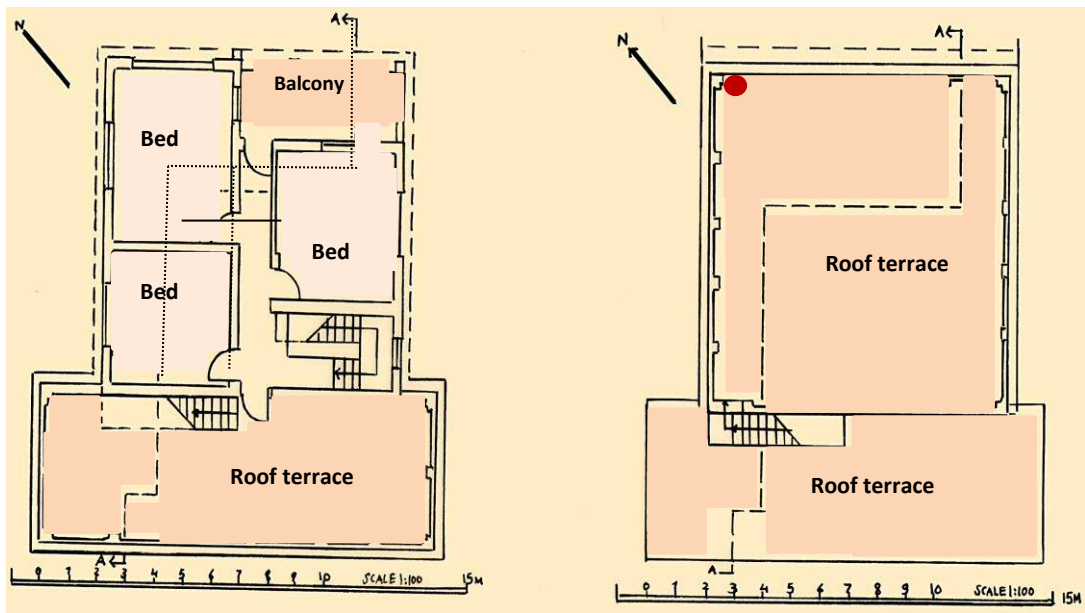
First floor level plan and roof terrace level plan (Researcher) Scale 1:100
